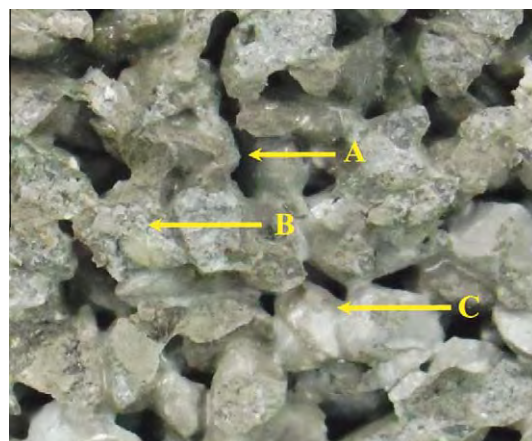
Fracture surface of PGC containing RC; (A) void; (B) fractured RC at attached mortar; and (C) geopolymer paste.
